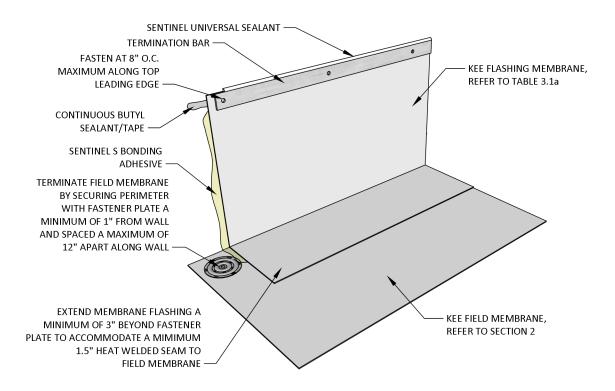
Adhered KEE Flashing Membrane at Wall/Curb with Horizontal Perimeter Fastening
